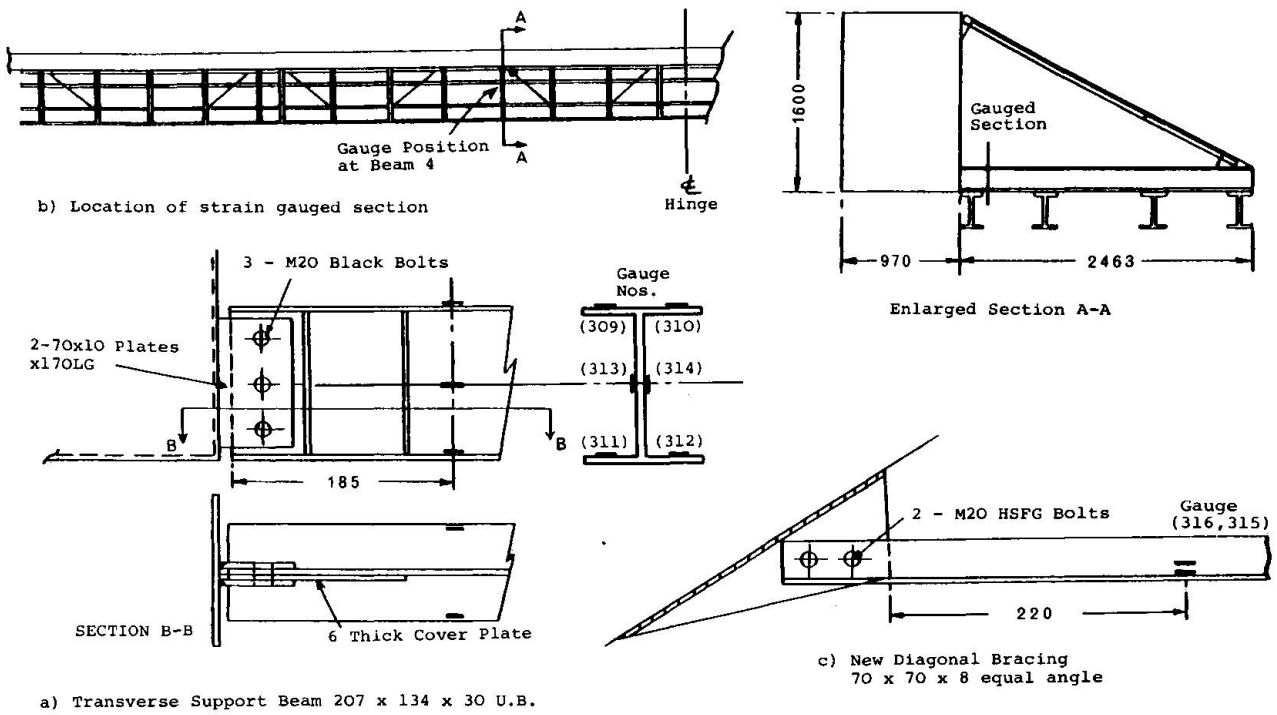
Details of Repaired Joint Structure and Strain Gauges.
